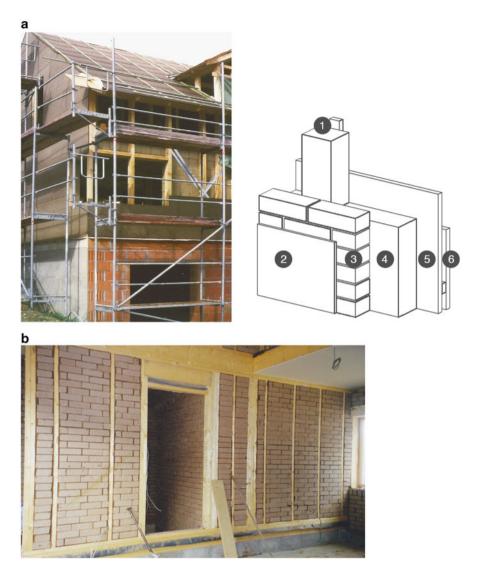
Timber-frame construction, multilayer exterior wall. (a) Version A: interior earth plaster. (1) Timber frame. (2) Interior earth plaster. (3) Light-clay block masonry. (4) Cellulose fiber insulation. (5) Wood fiber insulation panel. (6) Rear-ventilated wood cladding. (b) Version B: exposed masonry, interior [88]
